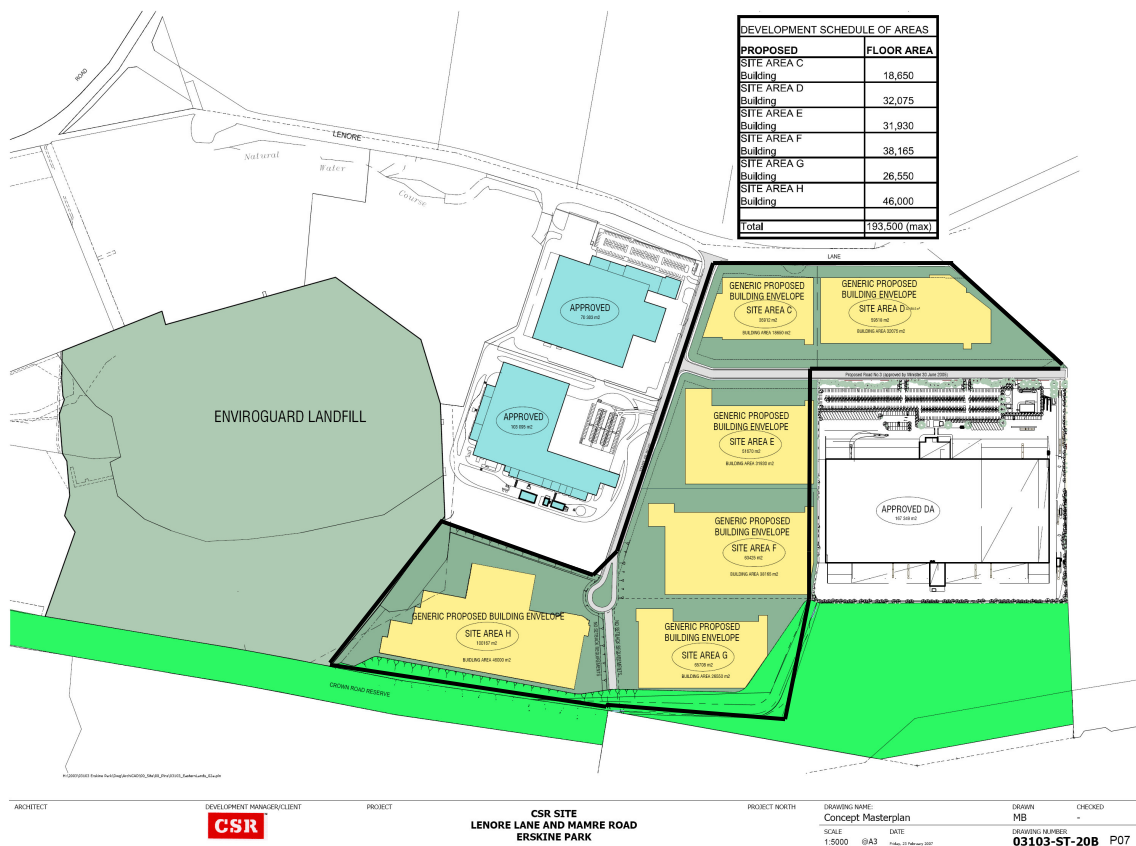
Concept Plan for the Proposed Warehouse and Distribution Centre
